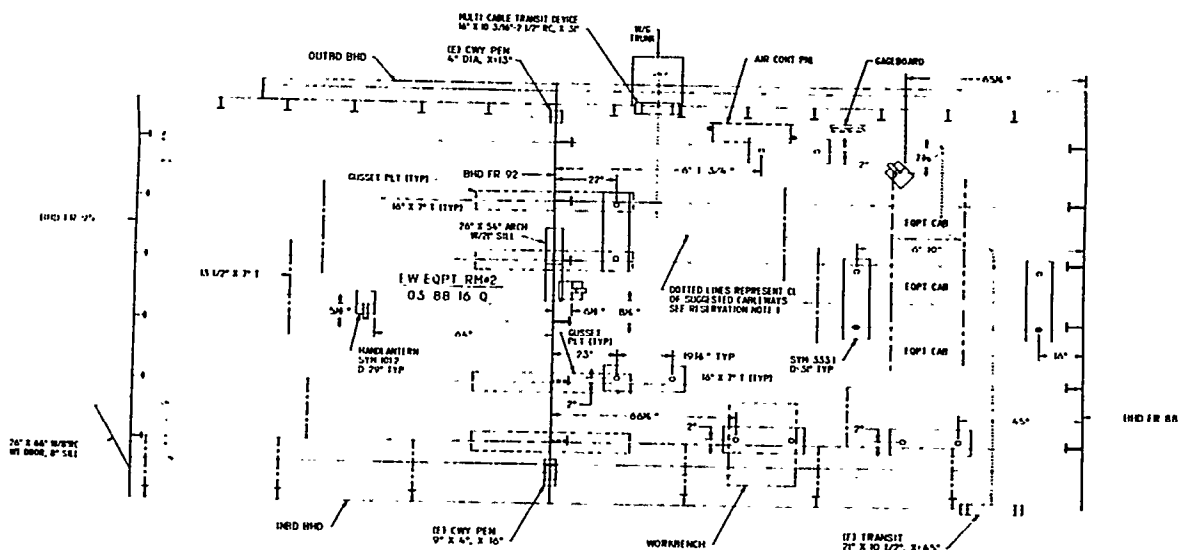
CV-64 Plan view E.W. Eq. Room #2 from model. (lighting and cableways)
